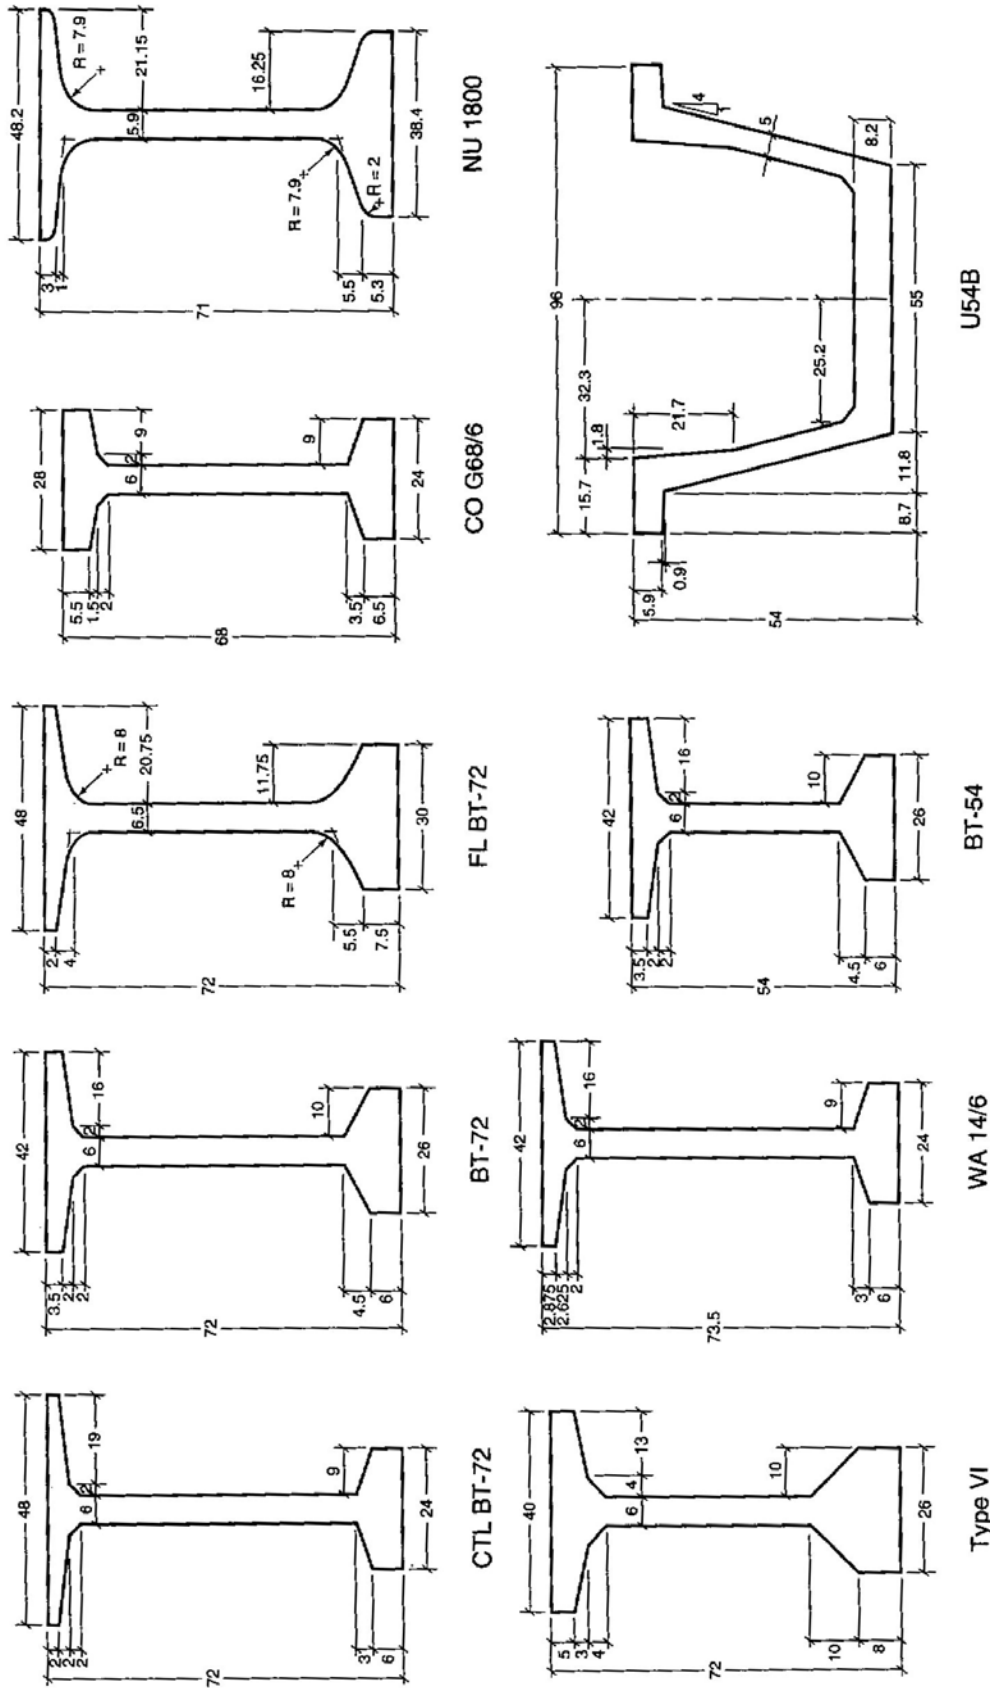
Cross Sections of Optimized Bridge Girder Sections [See Table 4.4(b)]
